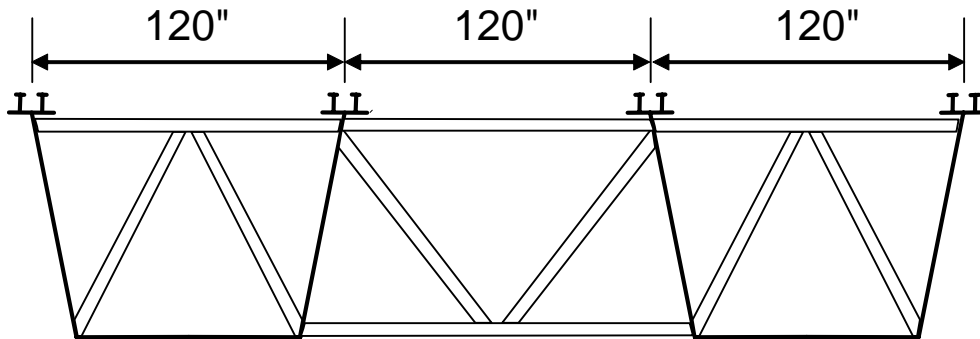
Cross Section of Twin Girder Bridge at Intermediate Location
